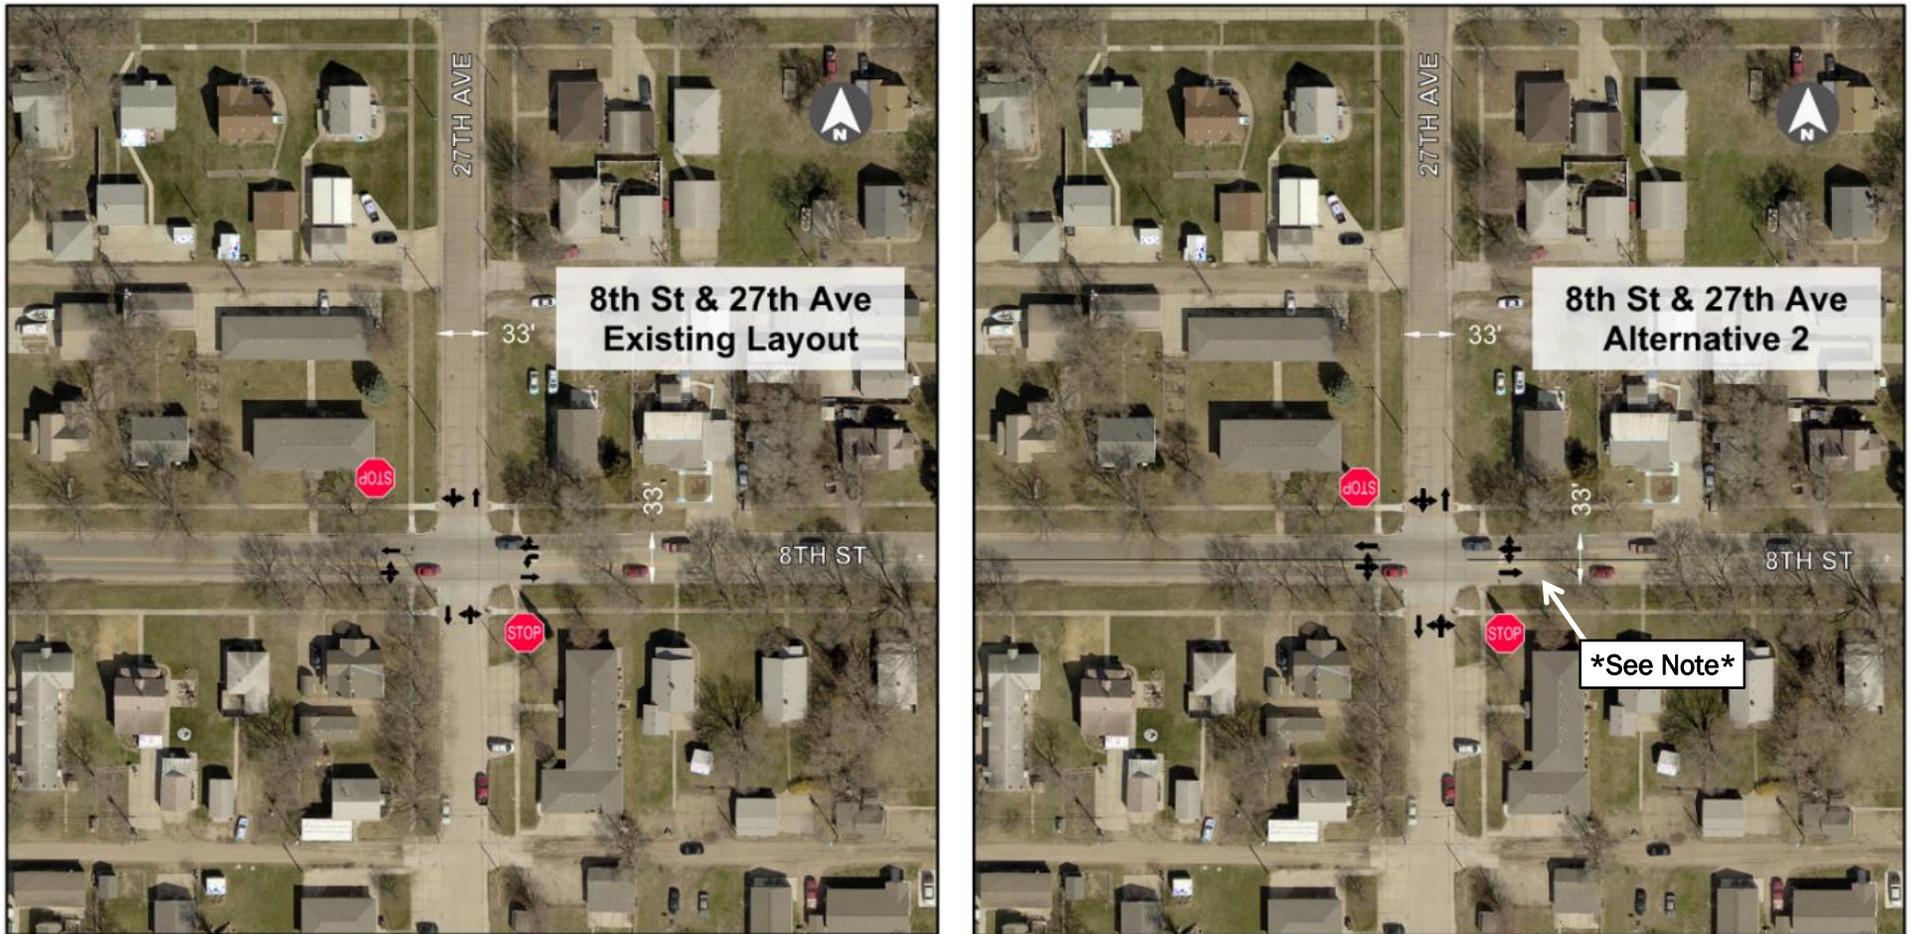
Alternative 2 – 27th Avenue & 8th Street
